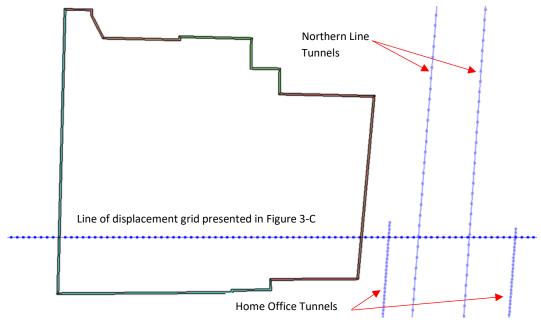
A: Plan view of PDisp model illustrating the outline of the proposed building and tunnel centre lines.
